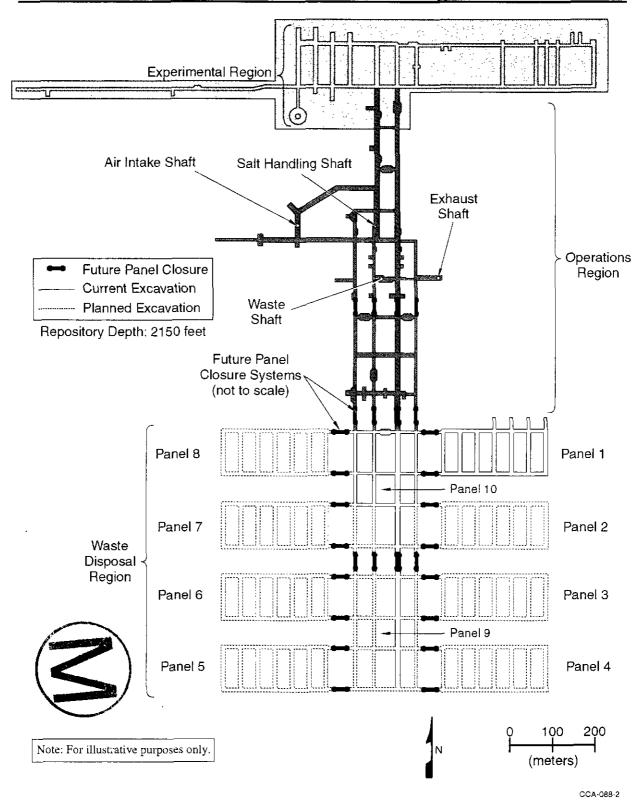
Plan View of WIPP Underground Facility and Panel Closure Systems
